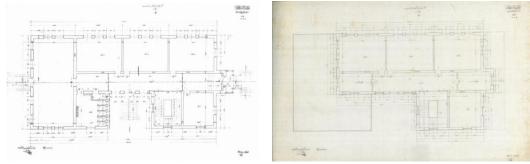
a) Göztepe Primary School Ground Floor Plan [42], b) Göztepe Primary School Second Floor Plan [51]
